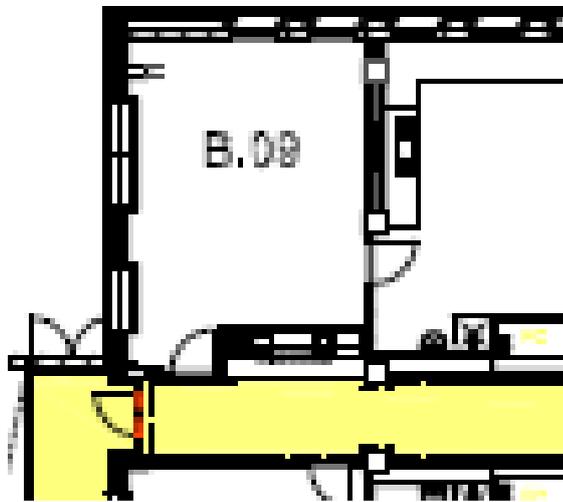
an enlarged view of the second room in the first floor of the chemistry building
